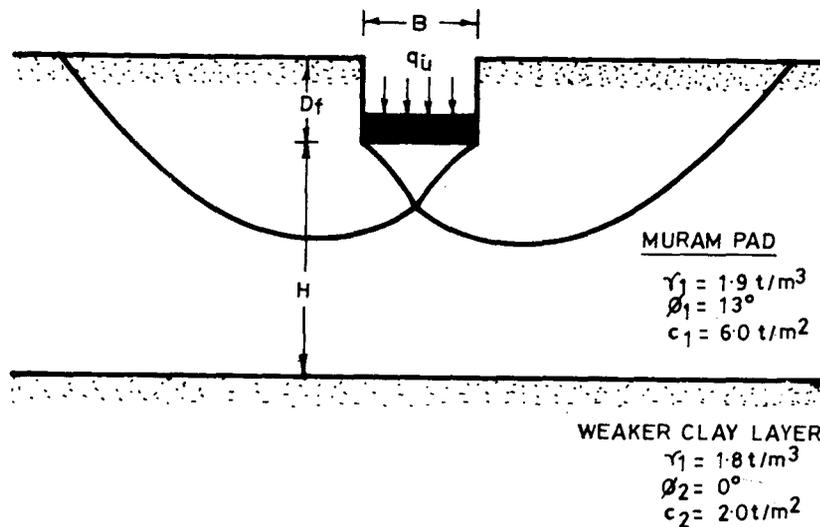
CONTINUOUS ROUGH FOUNDATION LAYERED SOIL H/B IS LARGE
